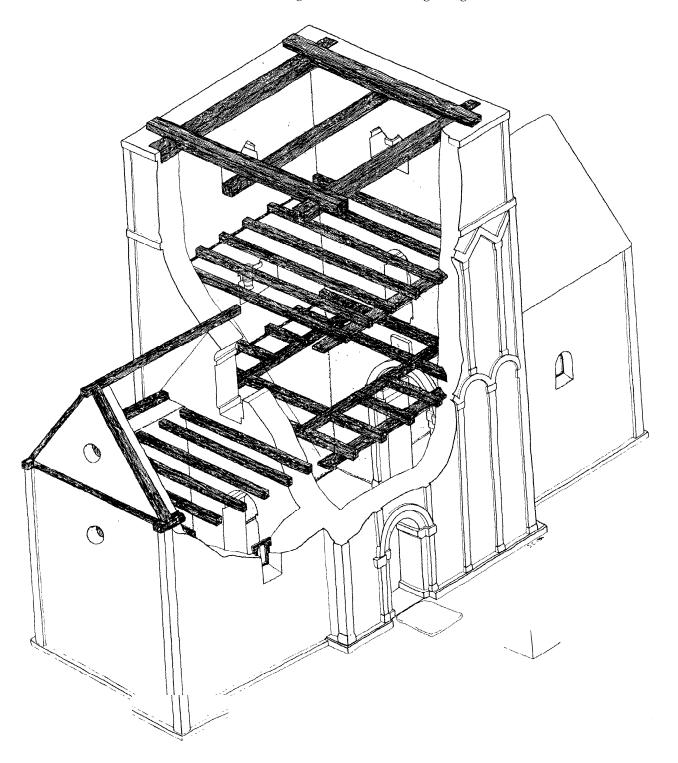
Barton-upon-Humber: isometric reconstruction of floor and roof timbers in the Anglo-Saxon church, based on evidence encapsulated in the walls (drawn by Steve Coll)
